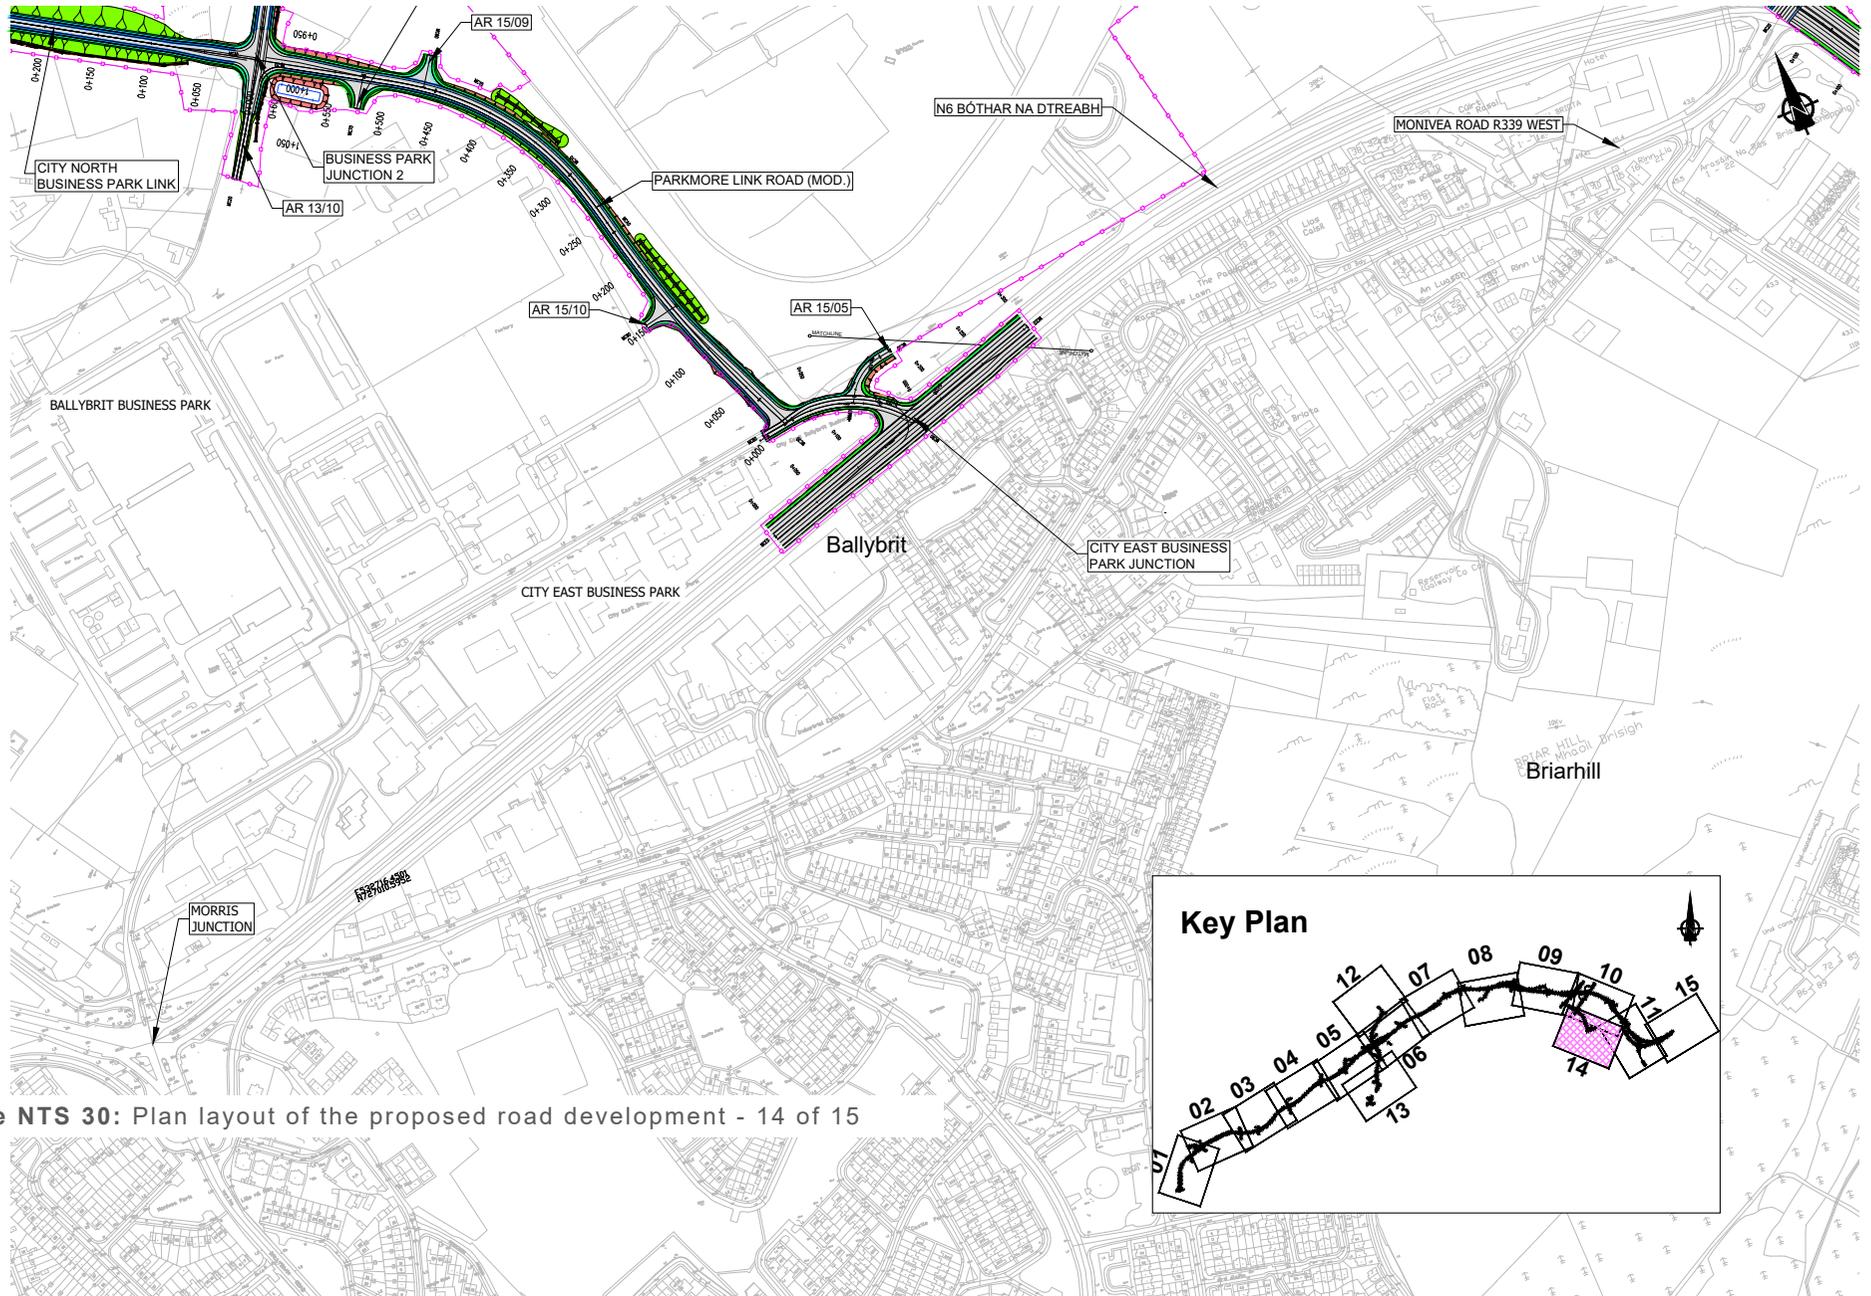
Plan layout of the proposed road development - 14 of 15
